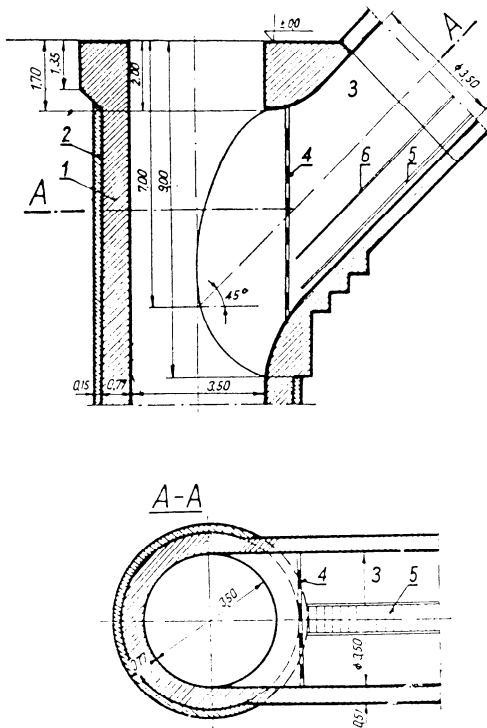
Design of ventilation shaft head 12 ft (3.5 m) diameter.
